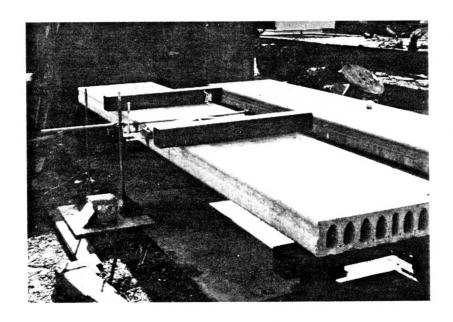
Test No. 1, Plank Prior to Preload Application.
